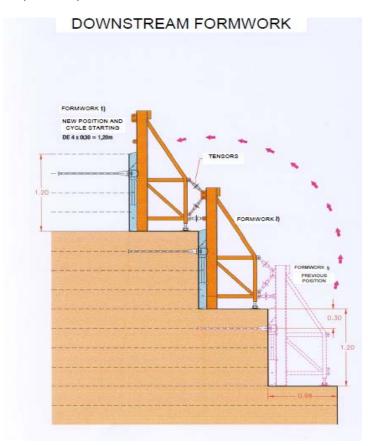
Dragados' Proprietary Formwork System for RCC Construction
